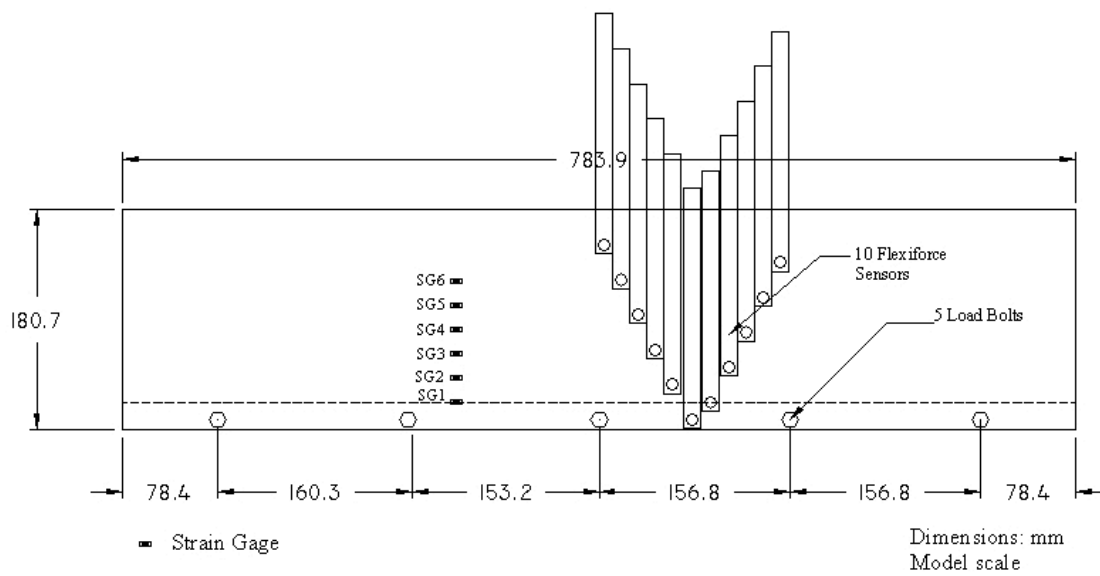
Flexiforce, strain gages, force-sensing bolts layout on south stiff and north flexible walls for LAA01.
